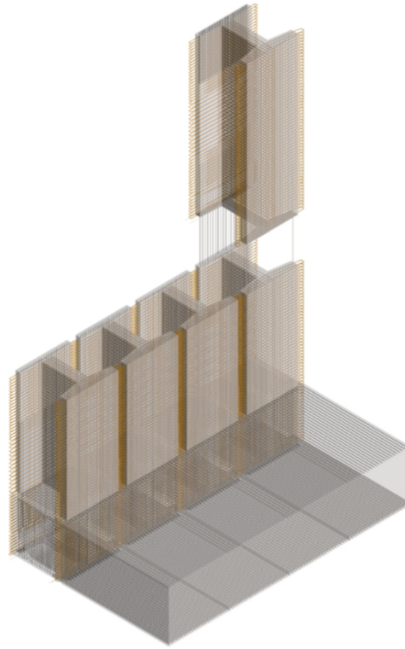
Cut-out of a lock chamber wall planned with prefabricated cellular concrete elements (Source BAW)
